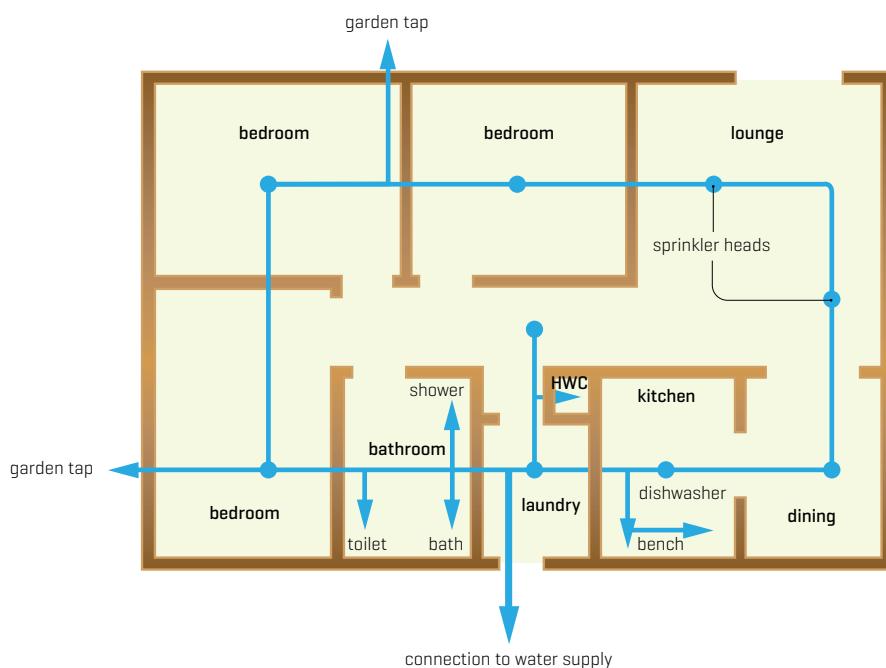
A piping loop in the ceiling plan of the house from which all cold water demand can be drawn.
